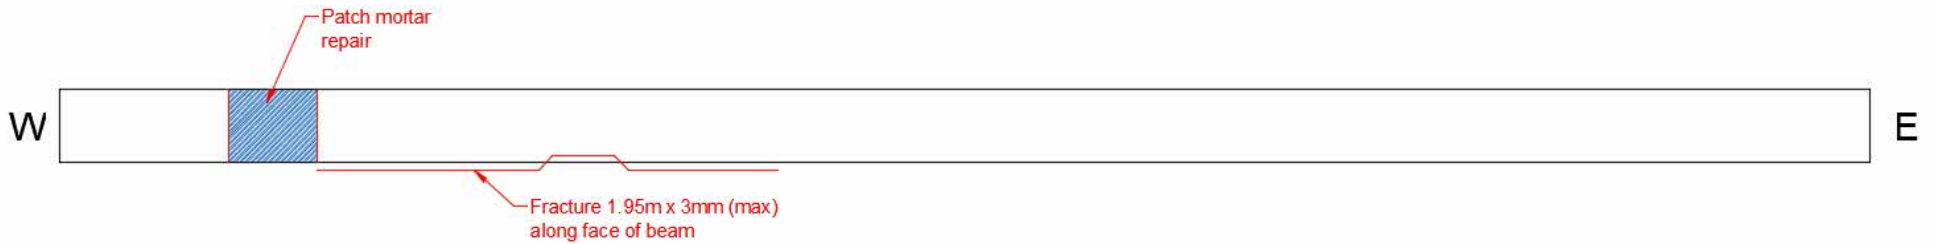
Plan View of Beam No.6 Defects (Photograph 12)
